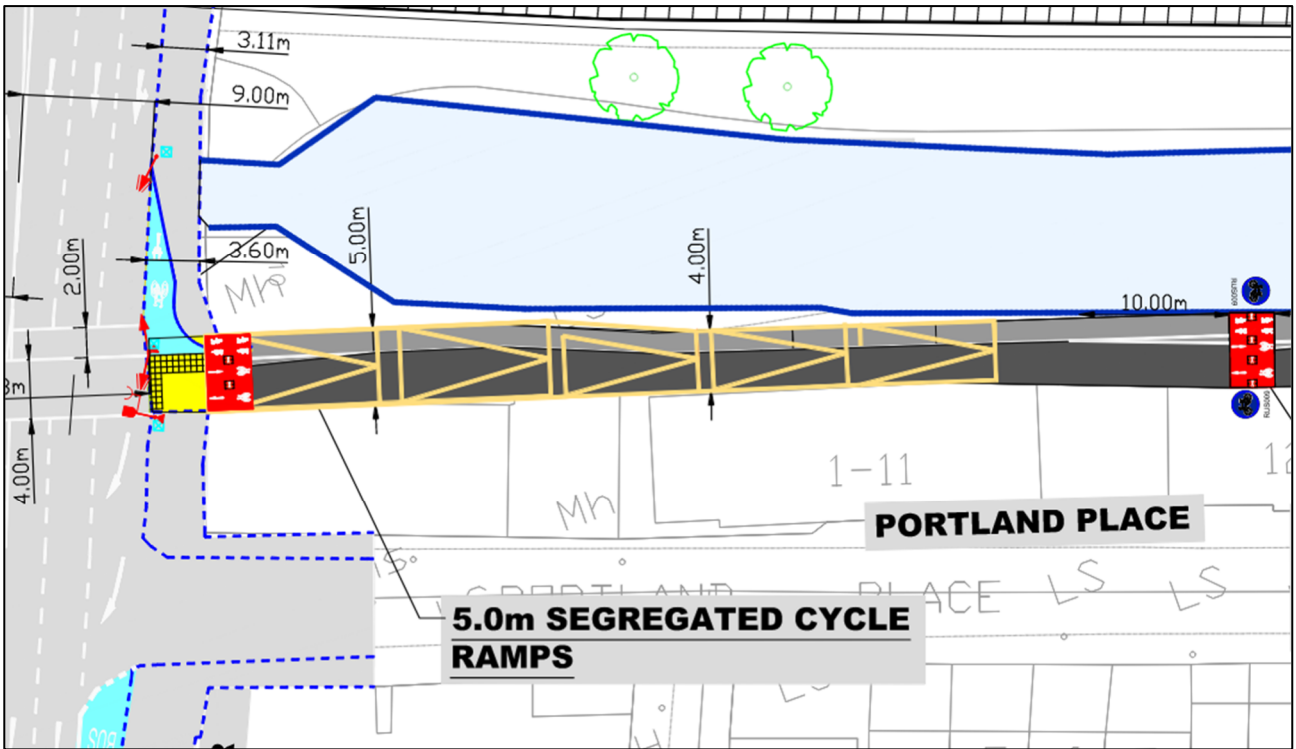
Extract from Permitted Part 8 Layout – Ramp to Dorset Street Lower
